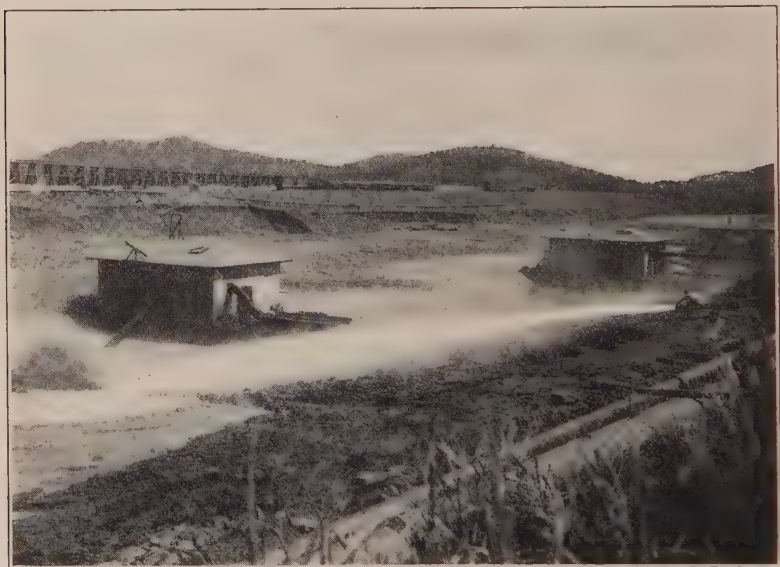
Hydraulic Excavation, Miraflores Dredging Barges.
